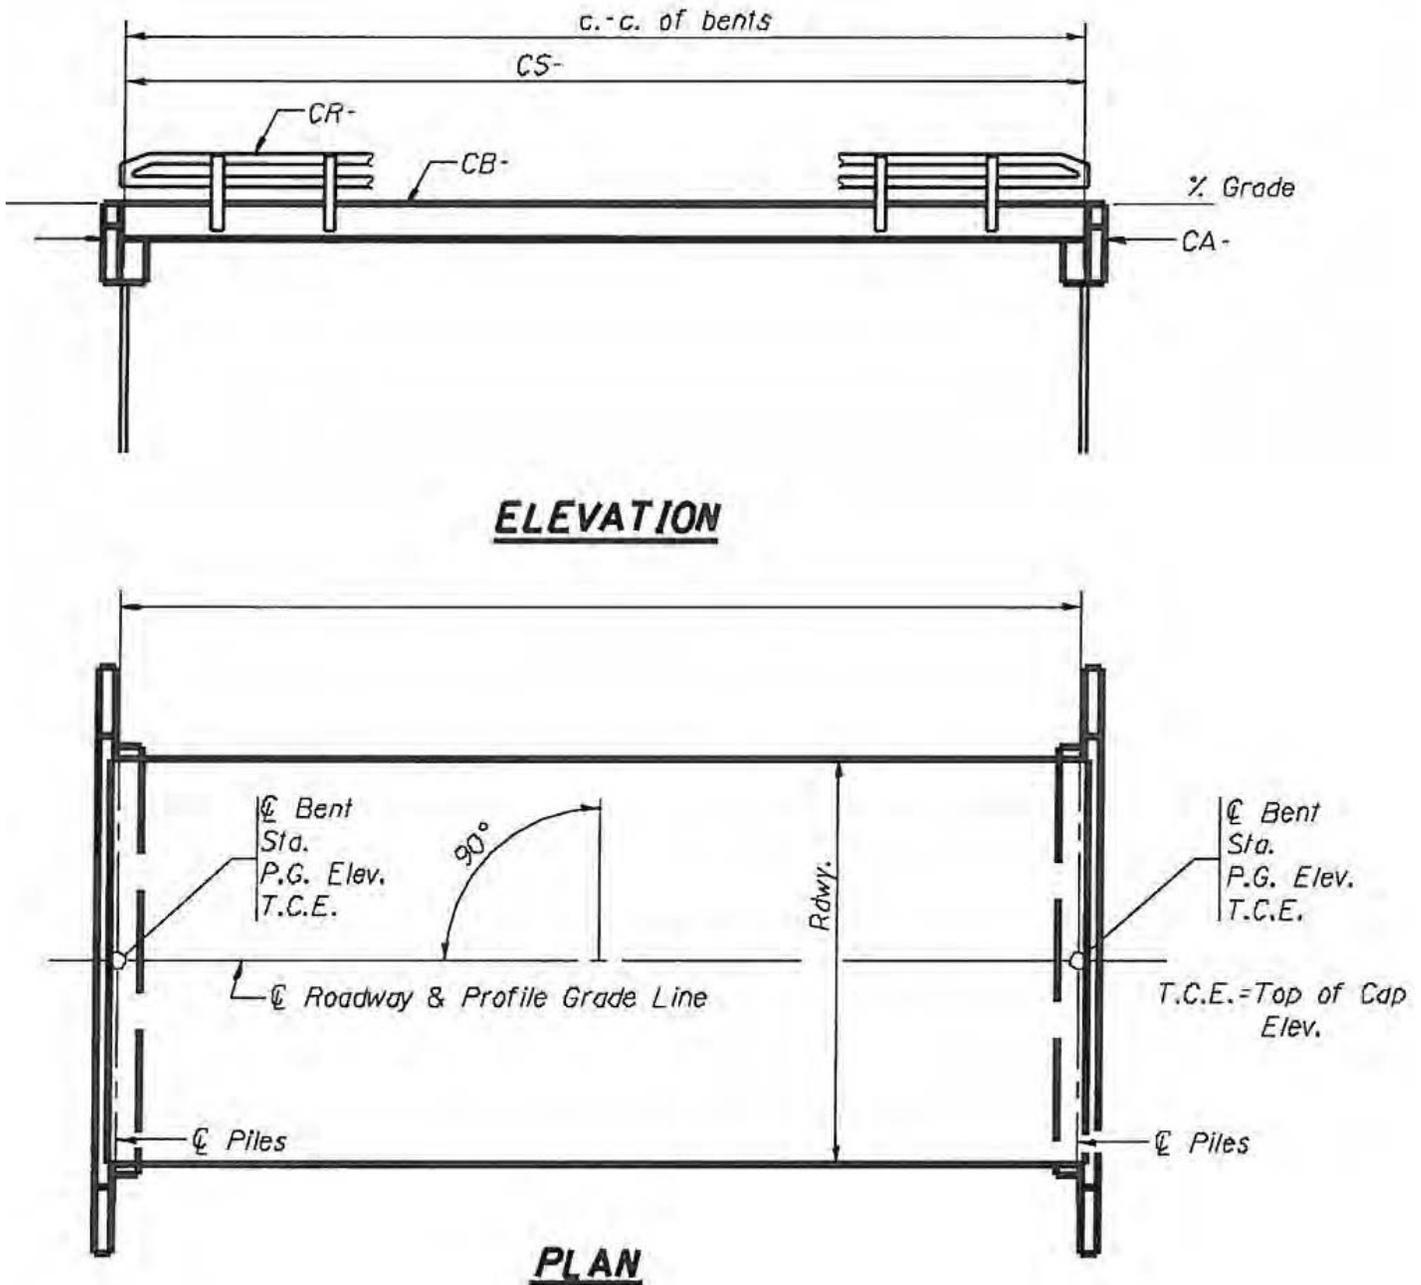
Sketch drawings from 2003 IDOT Standard Plans with dimensions similar to the Coffin Road Bridge.
